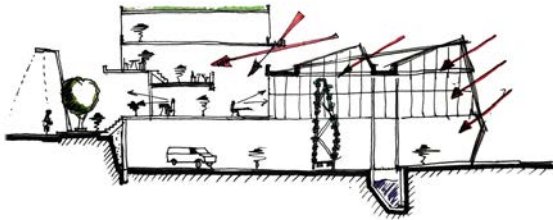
Greenhouse section sketch 3 (Author 2018)
